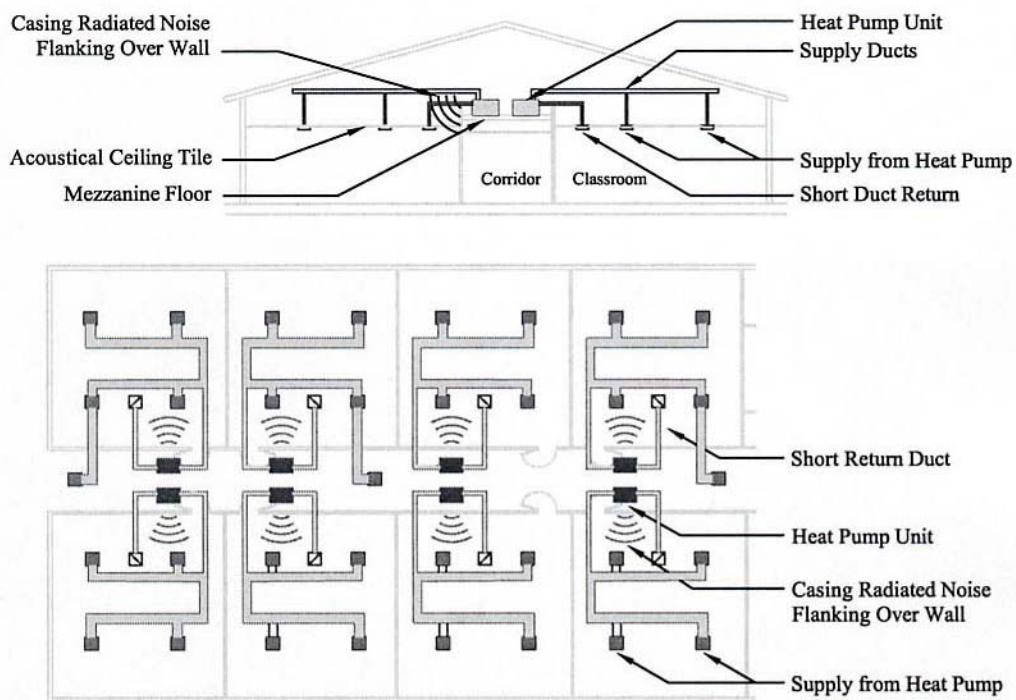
Conceptual section sketch and floor plan of Case Study 2: Mezzanine Heat Pump System.
